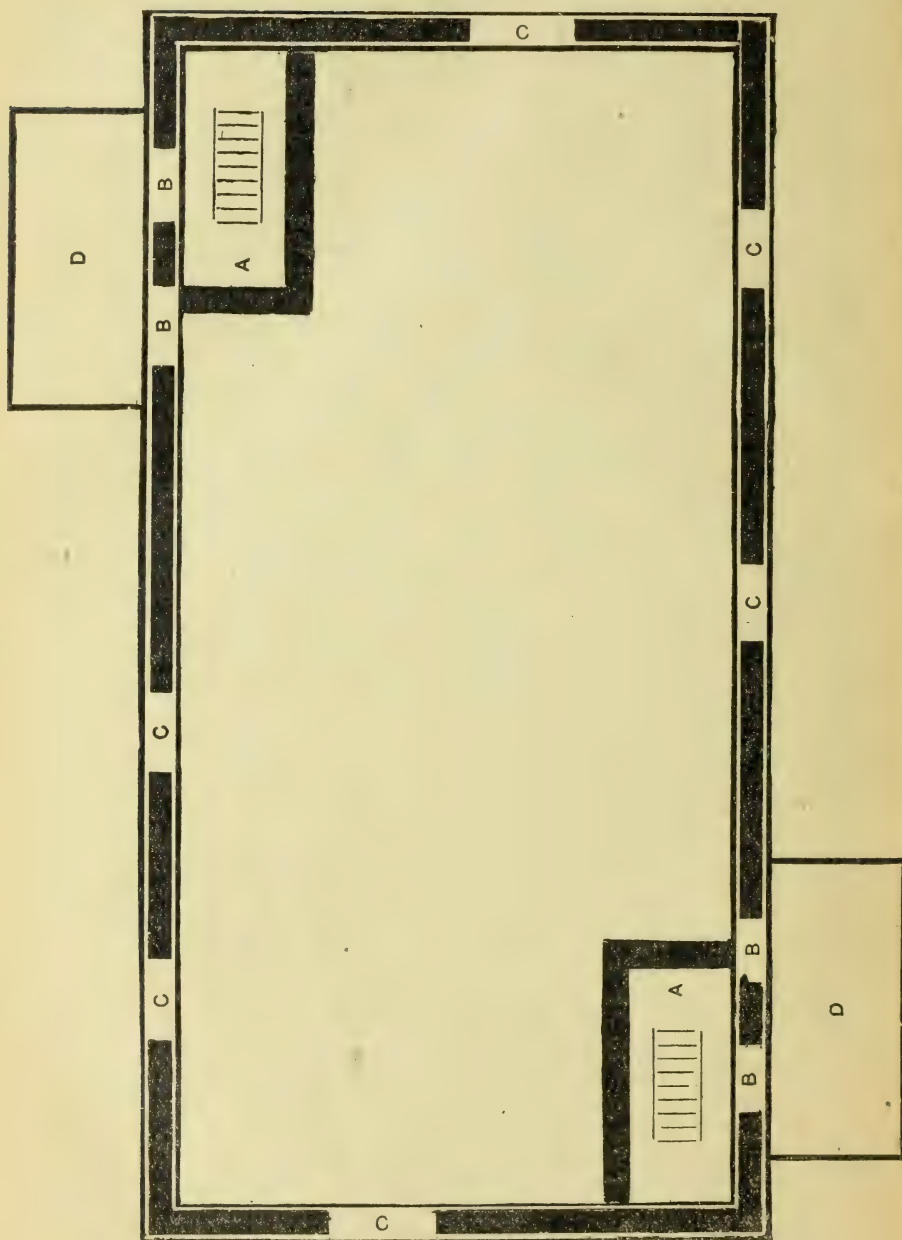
, DORN'S FIREPROOF STAIRWAY, FLOOR PLAN.
